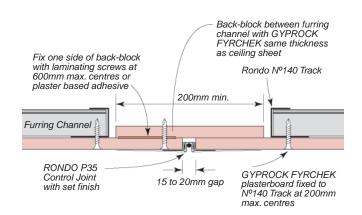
CONTROL JOINT PARALLEL TO STEEL FRAMING – 2 LAYERS
